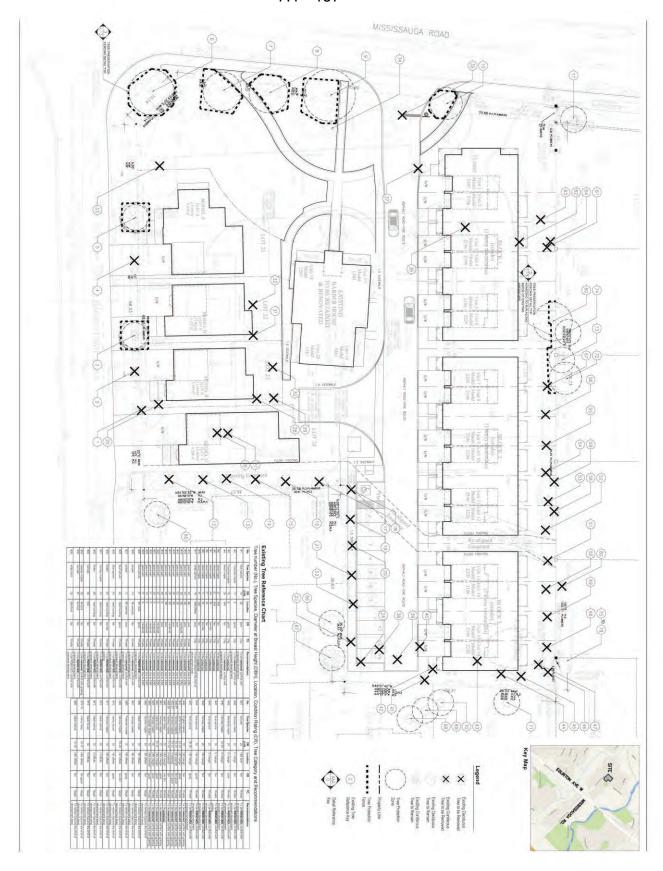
Arborist's Plan and layout of the 5155 Mississauga Road property.
